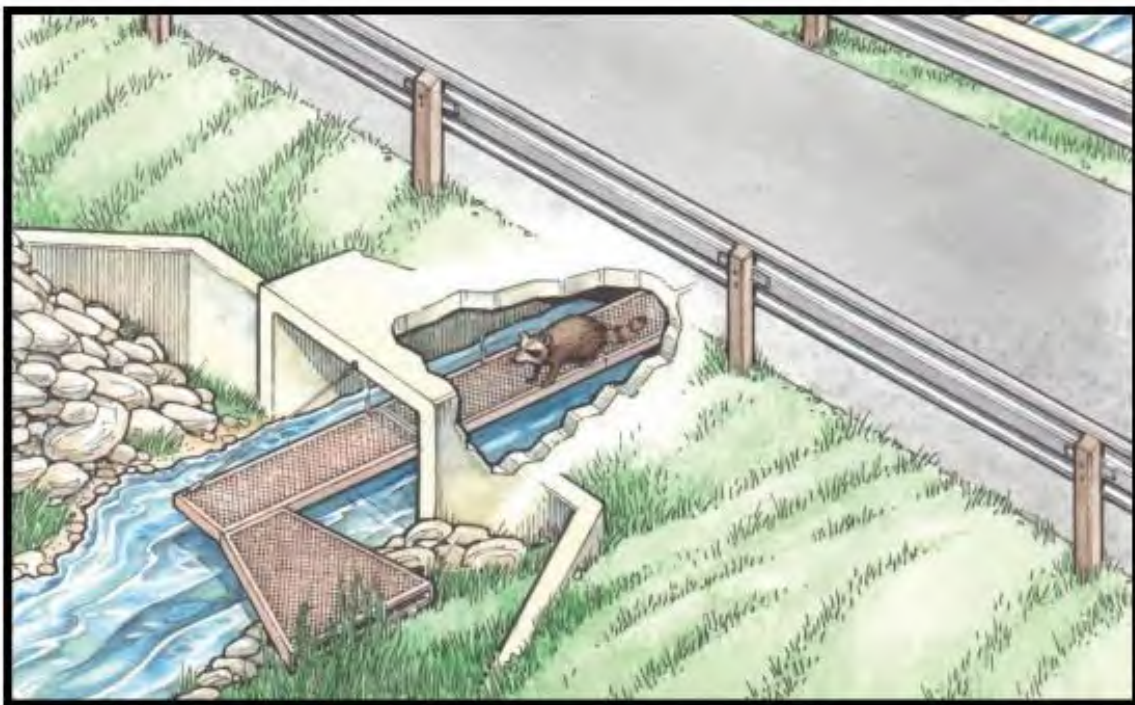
Wildlife underpass (box culvert) with terrestrial shelf (© Roscoe Culvert via Danby et al., 2016)
